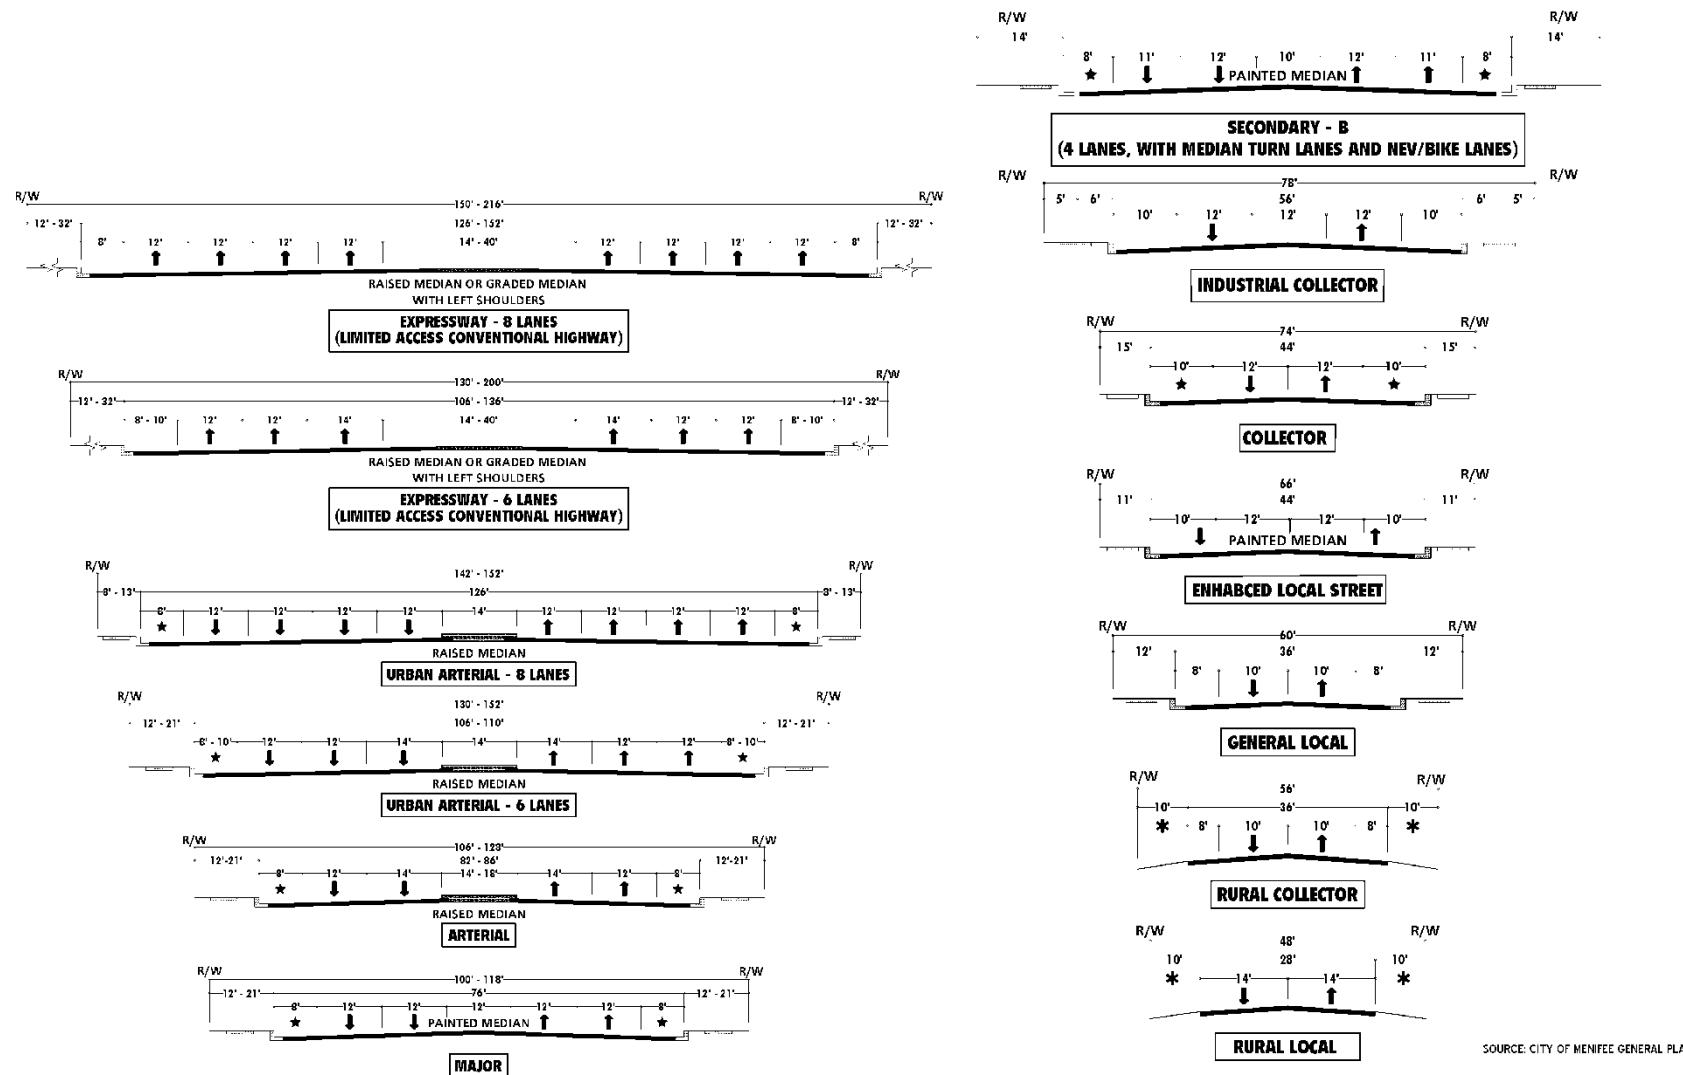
CITY OF MENIFEE GENERAL PLAN ROADWAY CROSS-SECTIONS
